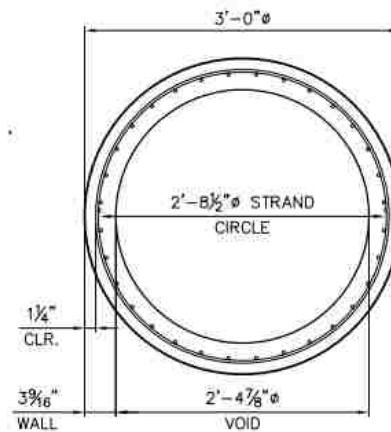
Elevation of pile-column, showing dimensions (courtesy of Concrete Technology Corporation)
